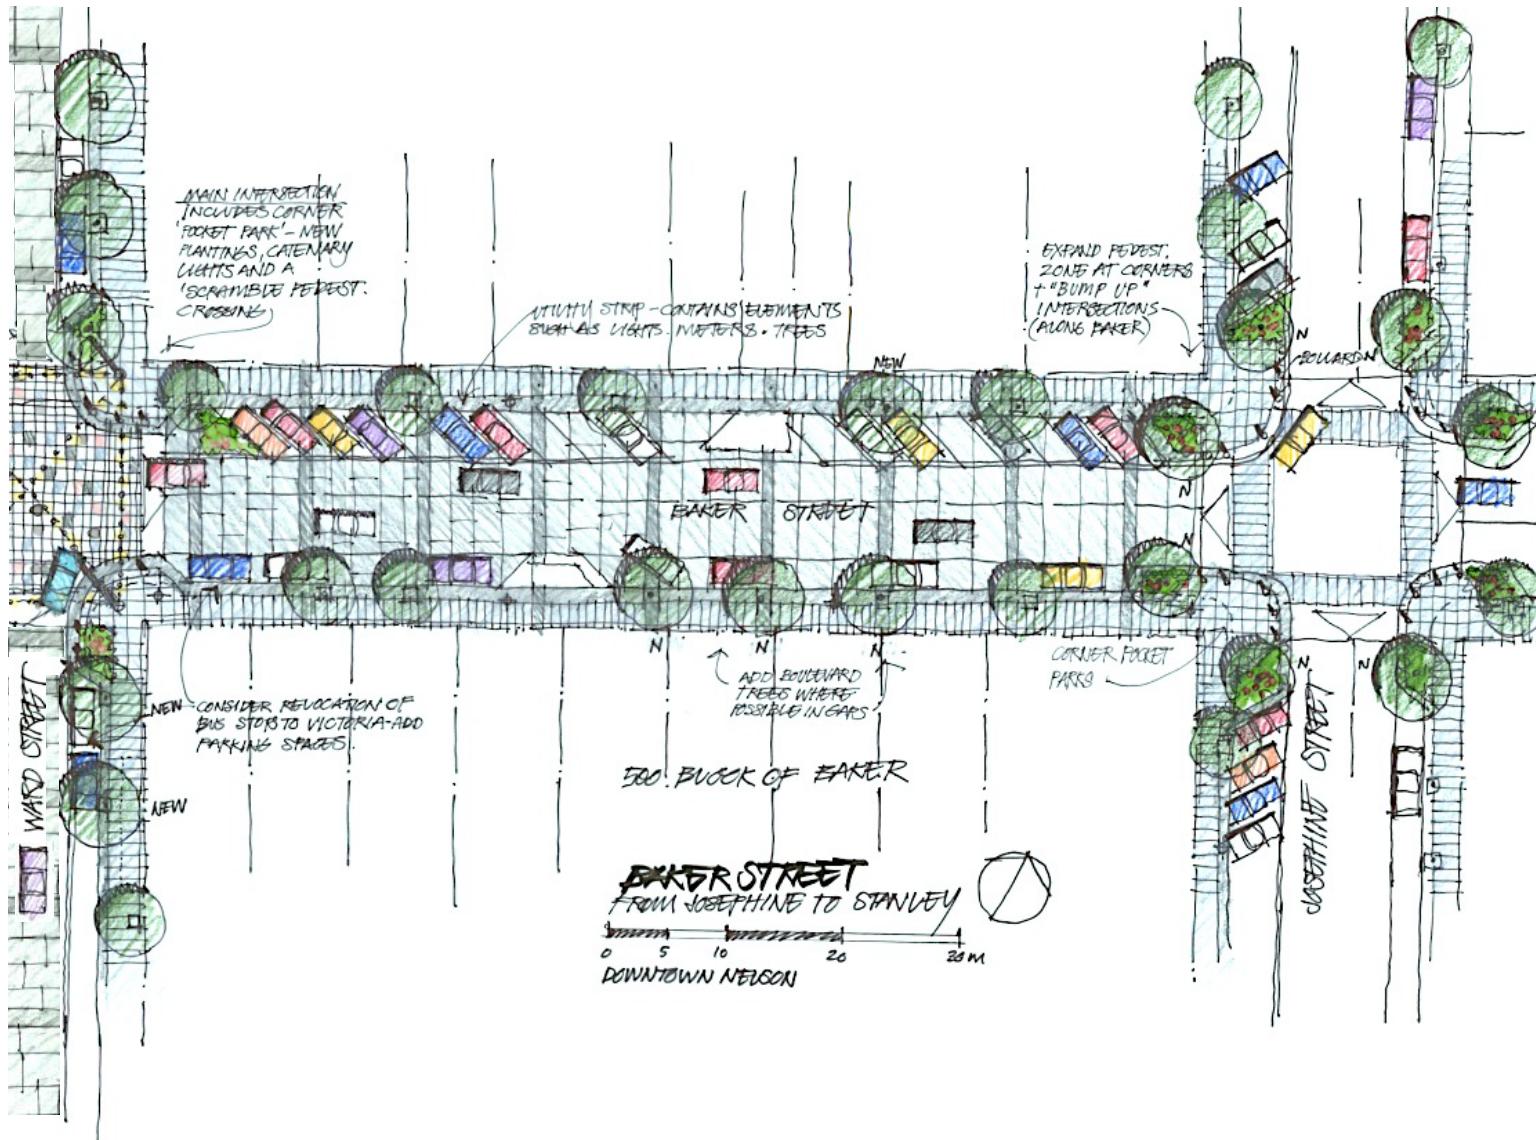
Redesign concept plan for Baker Street from Ward Street to Josephine Street with the recommendation to expand this treatment east to Hall Street and west to Kootenay Street to complete a four block core section in the downtown.
